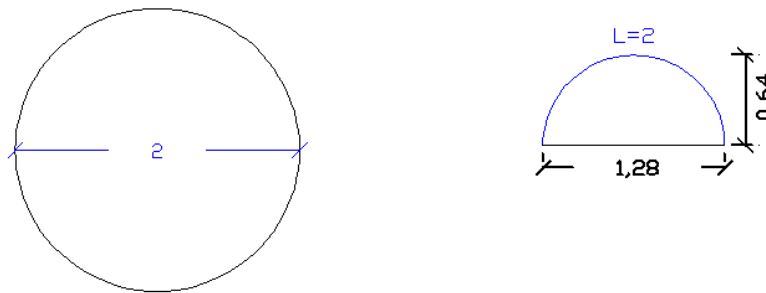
Sketches of the flat structure floor plan and the elevation of the final semispherical structure.
